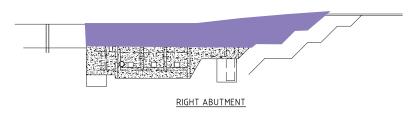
Eden Bann Weir construction sequencing (Sheet 2 of 4)
